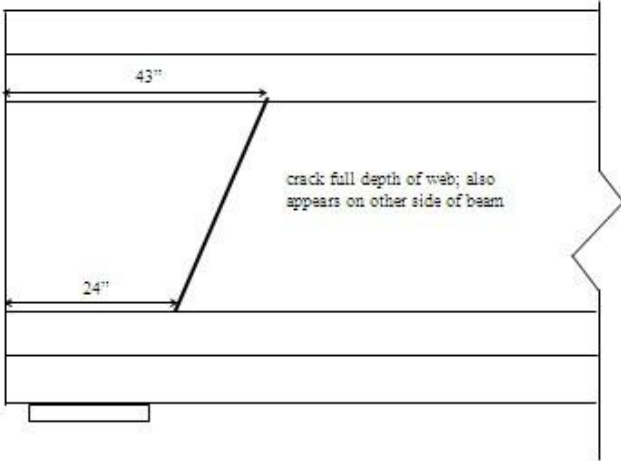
Crack Diagram For South Span Girder, North End, 4th Beam From East Side, West Face (Bridge 1, #7933).
